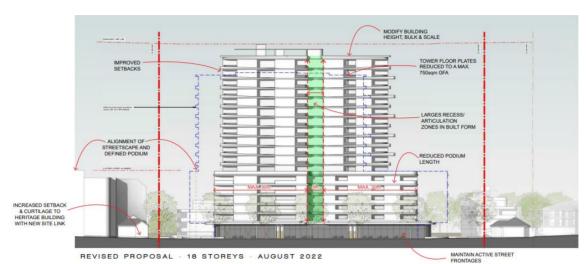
Old Northern Road elevation showing amendments from the previous version of the Planning Proposal (Source: Altis)
